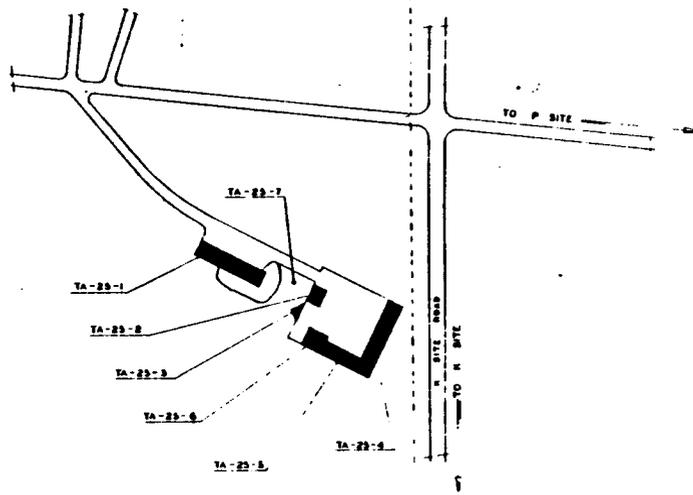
Structure Location Plan for TA-25 - V Site
